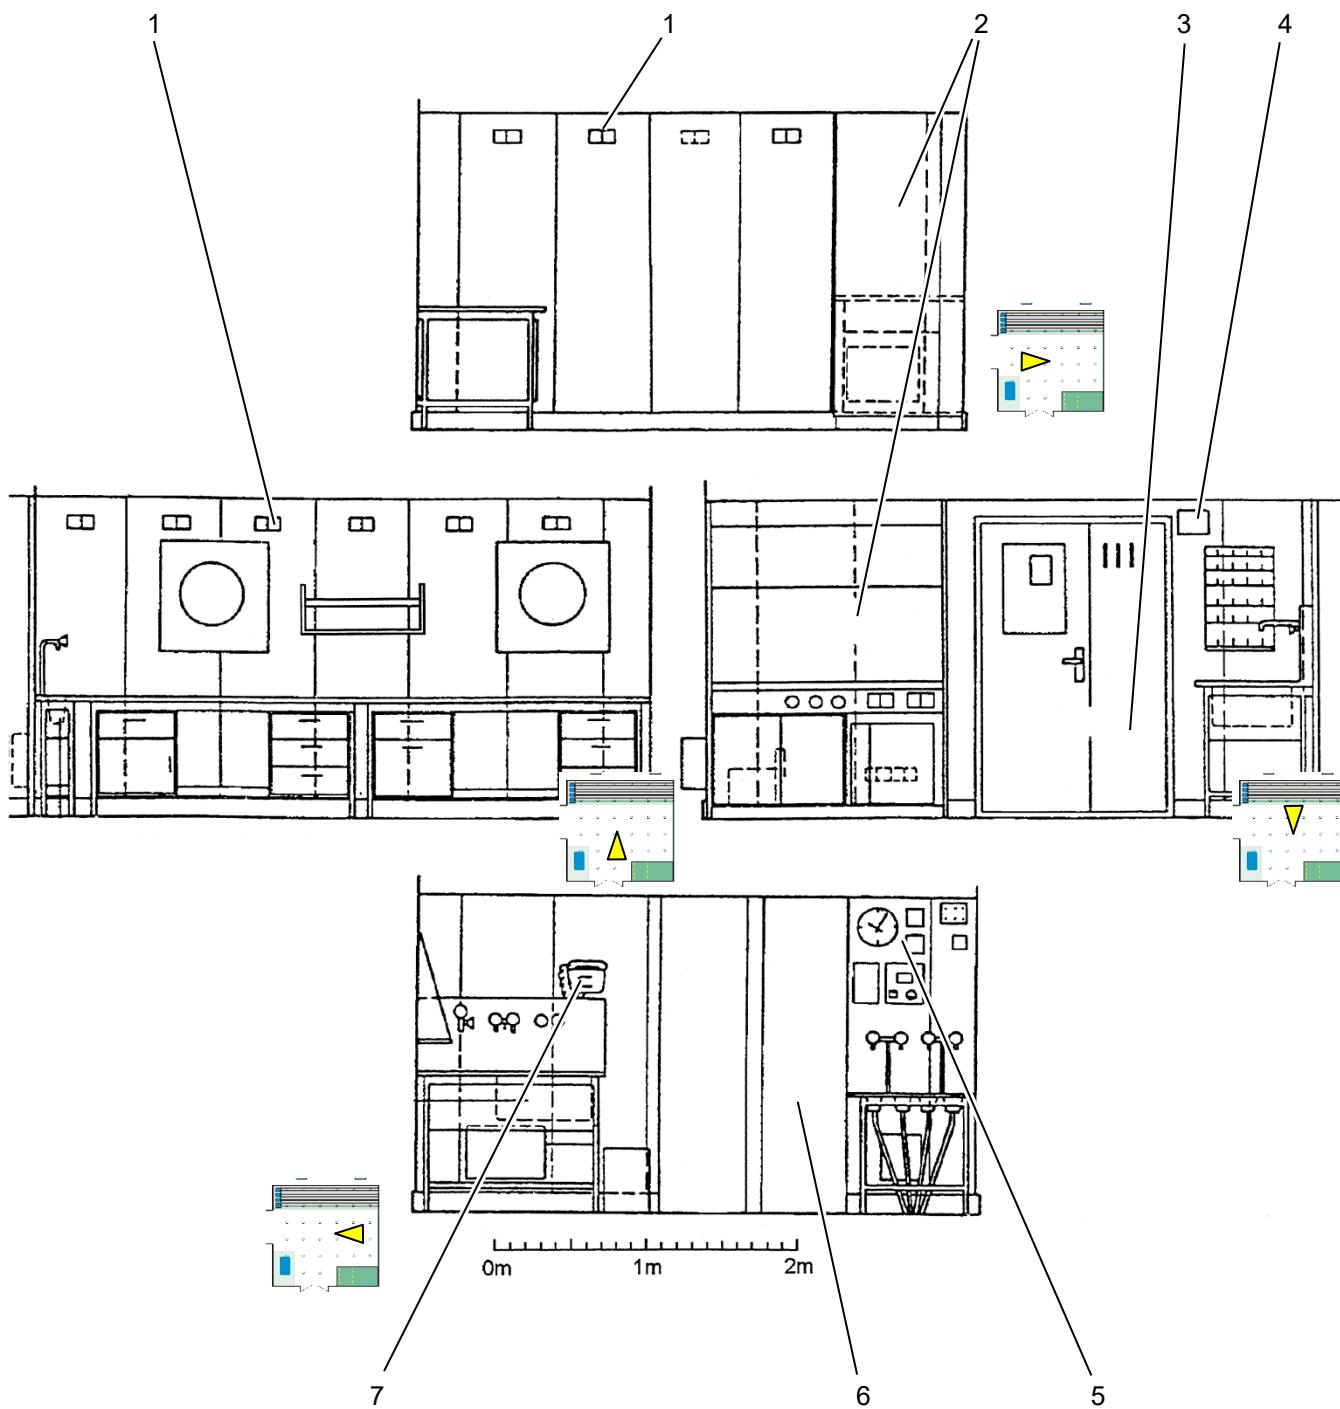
Dry laboratory 7 (detailed plan laboratory walls, status 1986)
